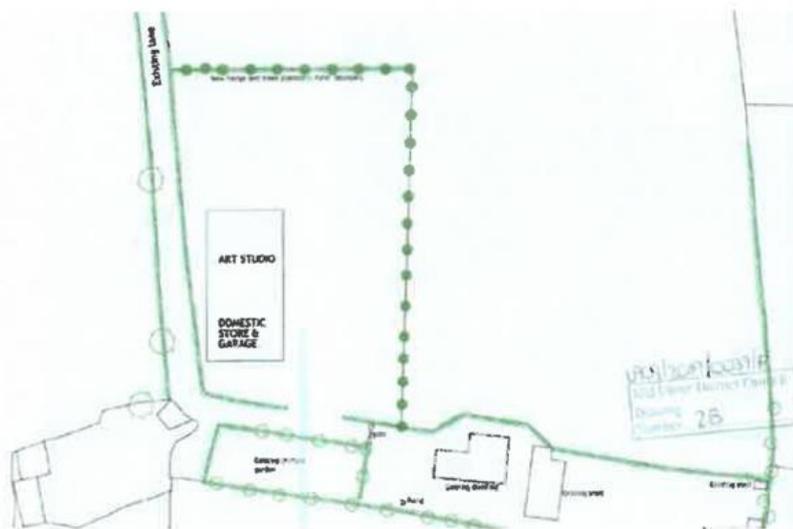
Snapshot of approved block plan in LA09/2019/0037/F
